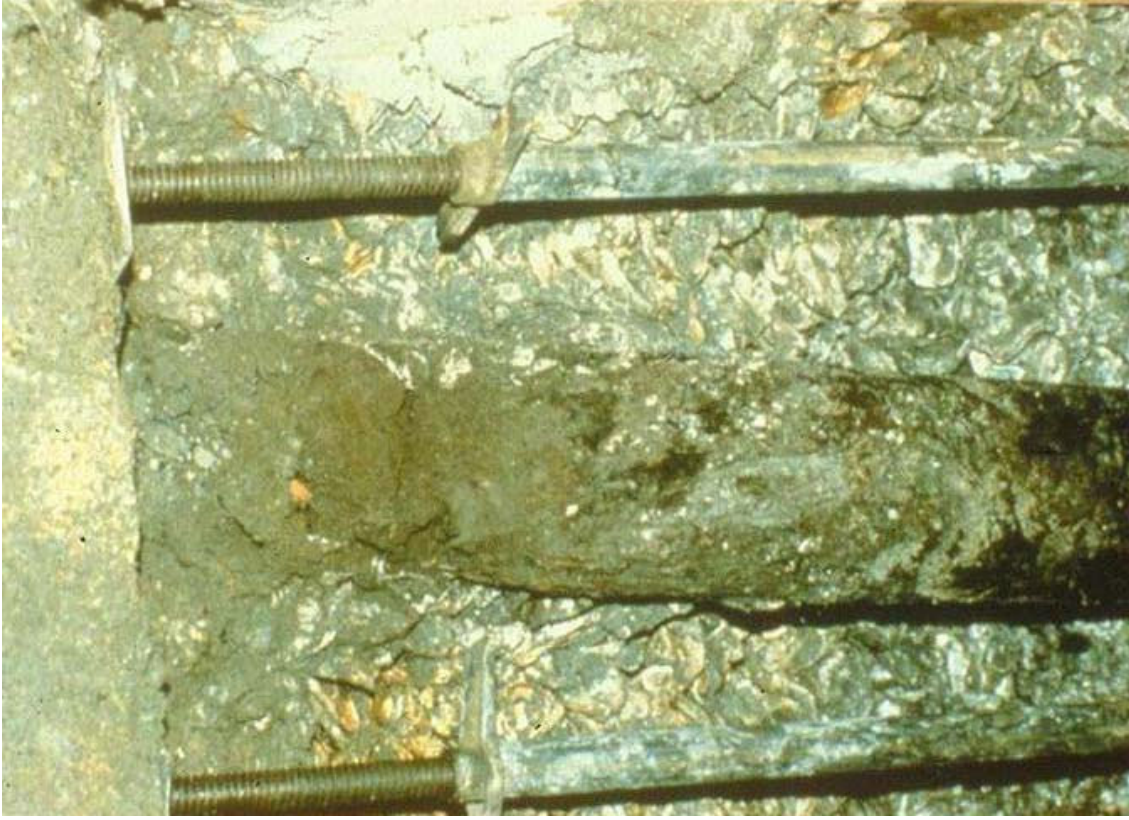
Examples of Wood Piles That Have Suffered Substantial Rotting
